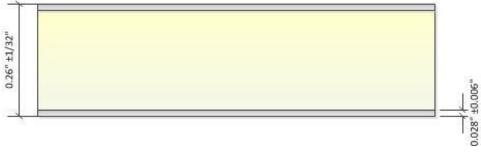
1/4-INCH GOBOARD® THICKNESS DIMENSIONS
